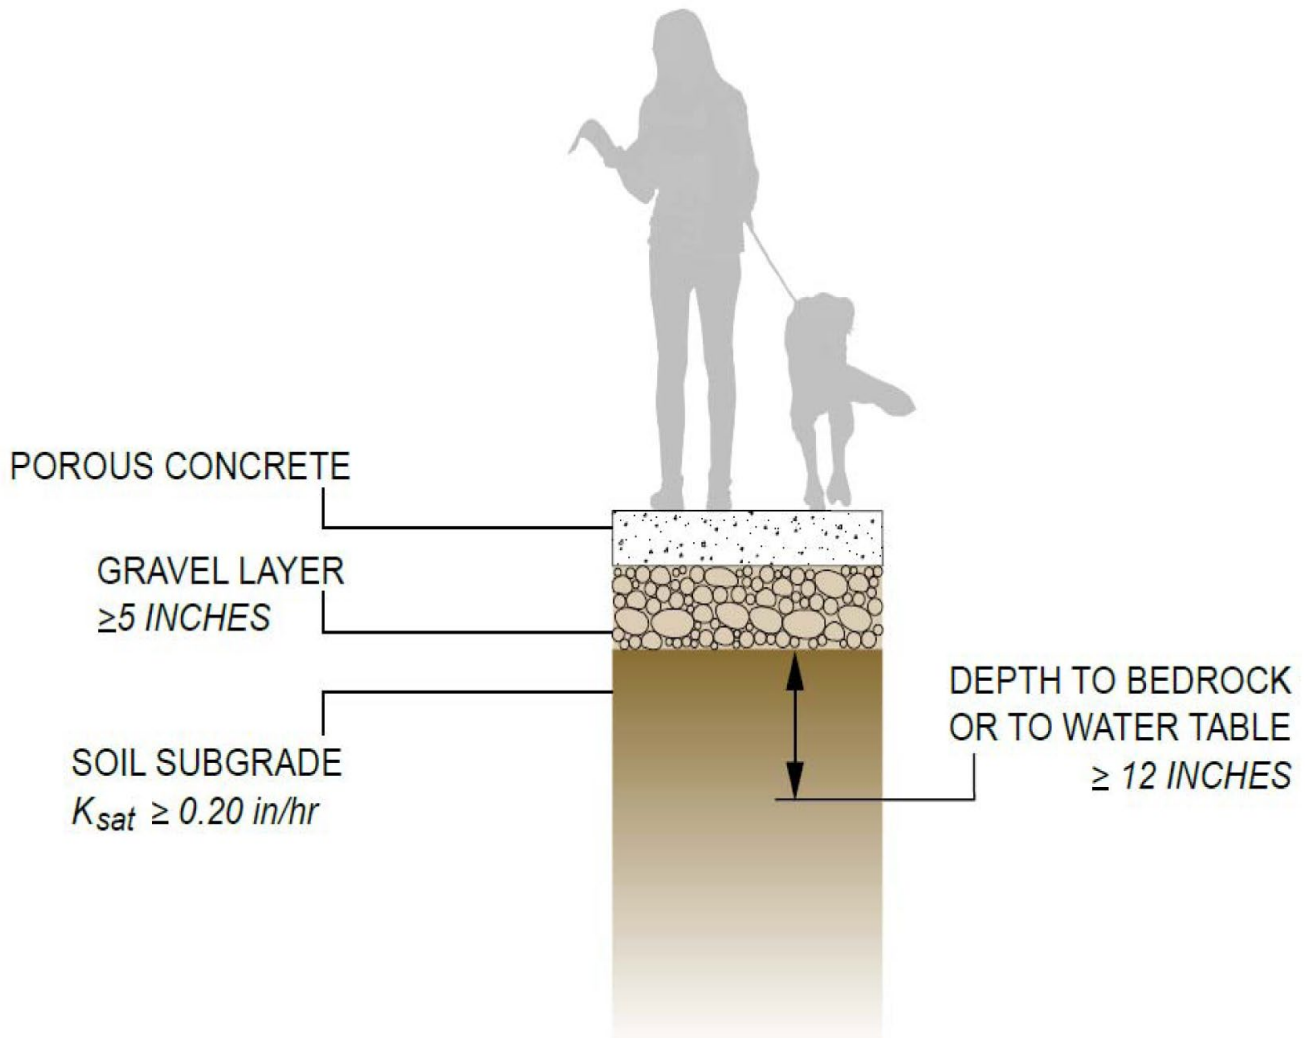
E-3 Typical Cross Section For Porous Concrete Pavement.
